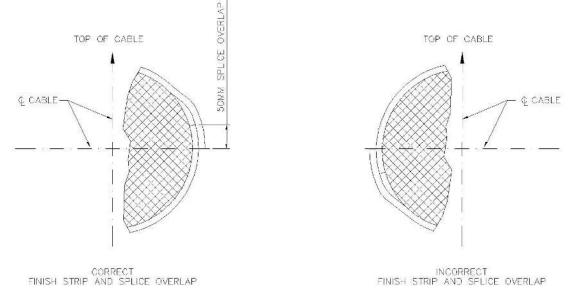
FINISH STRIP INSTALLATION AND SPLICE OVERLAP
